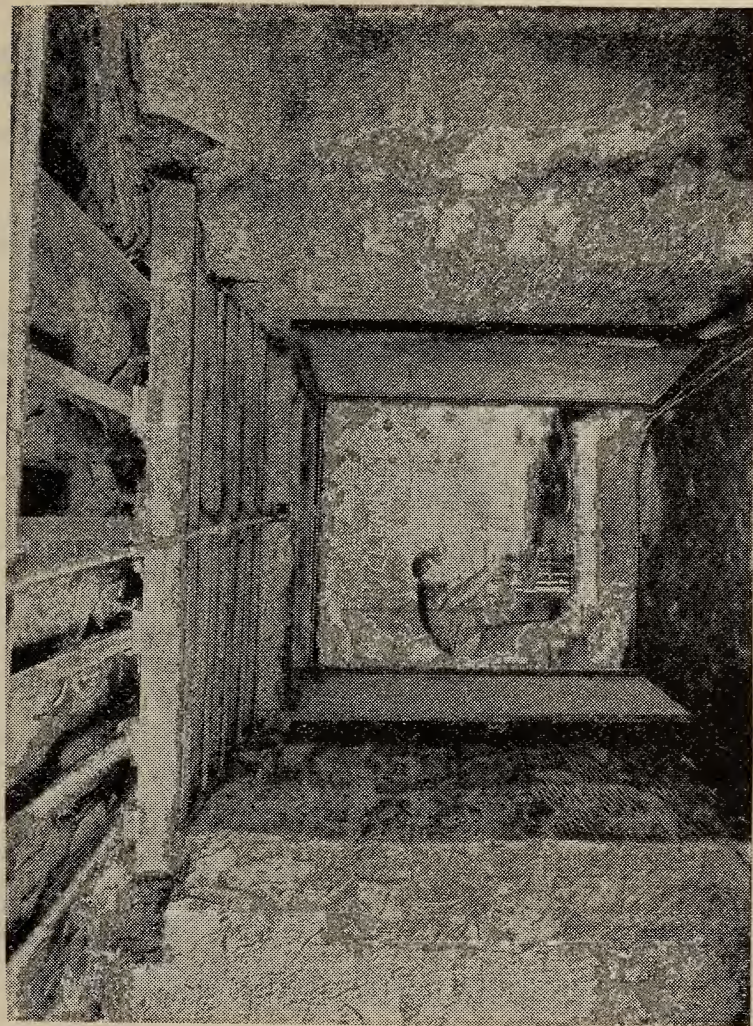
Oil fires can be prevented by storing the oil in clean, fireproof storage houses equipped with steel doors.
